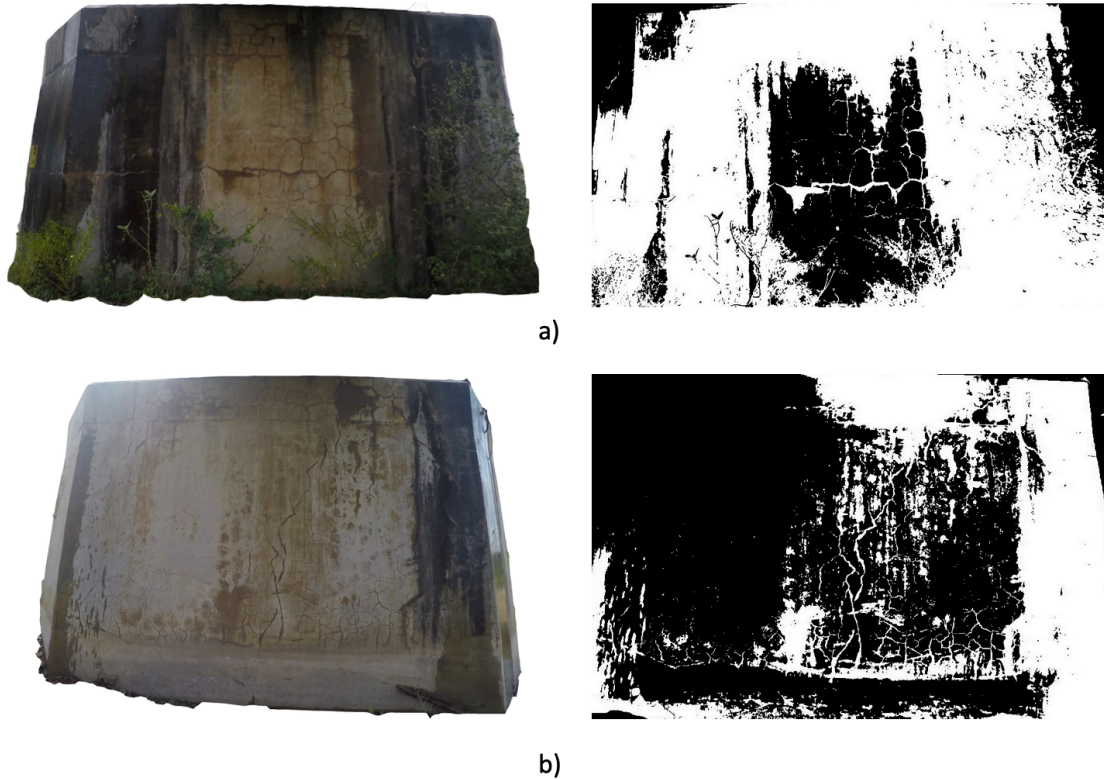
Damage quantification in the piers using image processing; a) Pier 13:62% damage and b) Pier 24:34% damage
